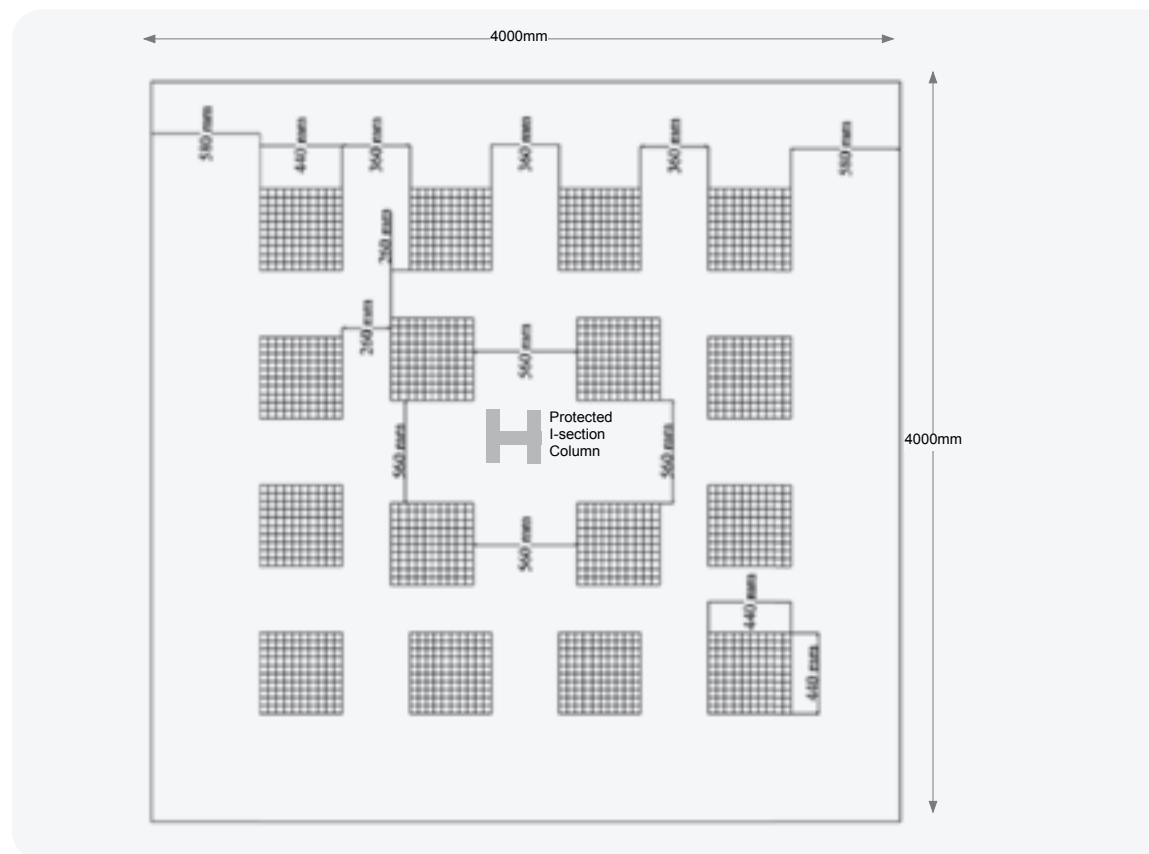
Plan of test enclosure showing crib layout and target fire-protected column.
